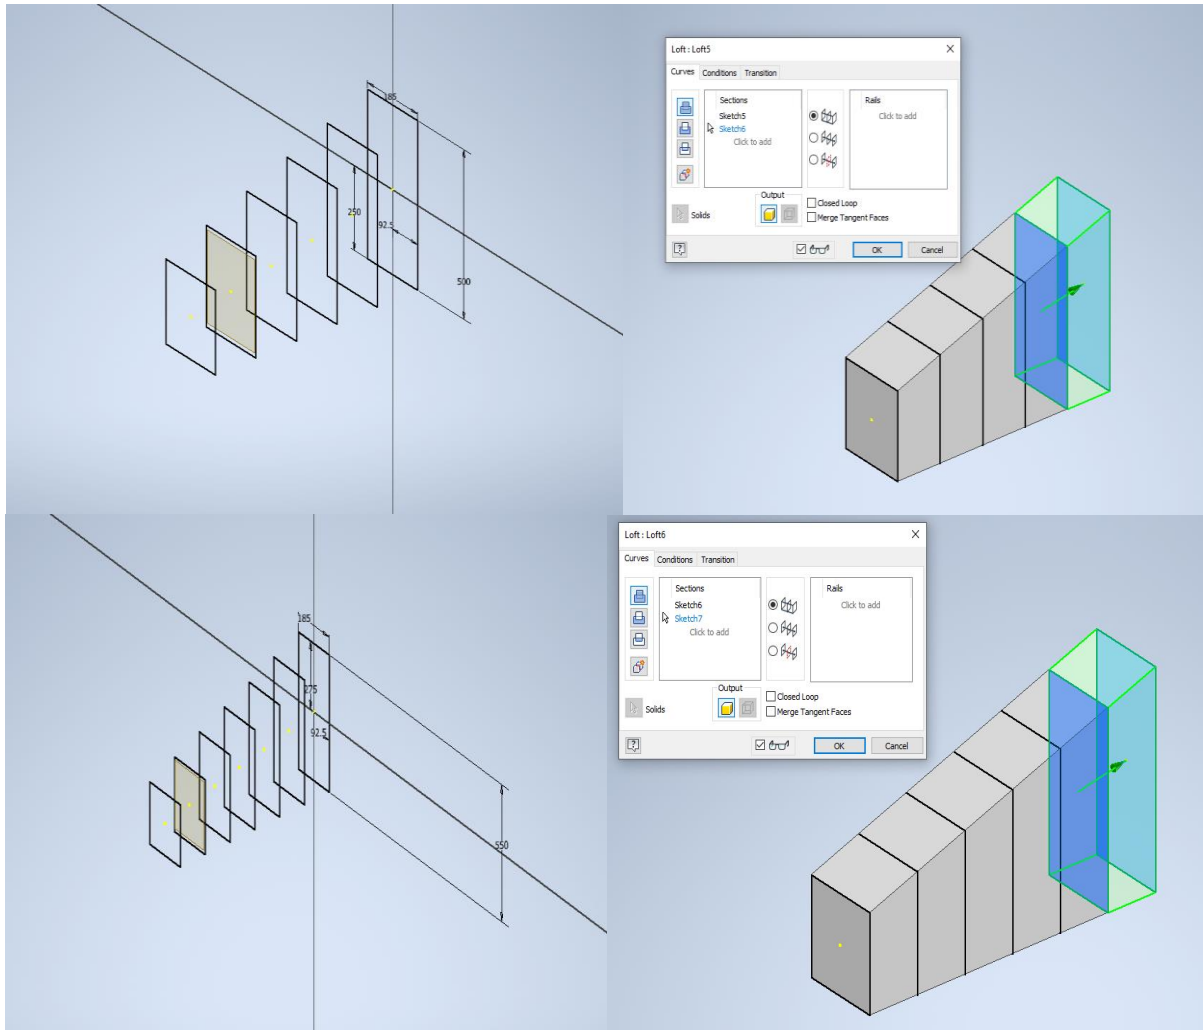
Drawing the upper section of the Main Diffuser Section of the chamber 2 (d).
